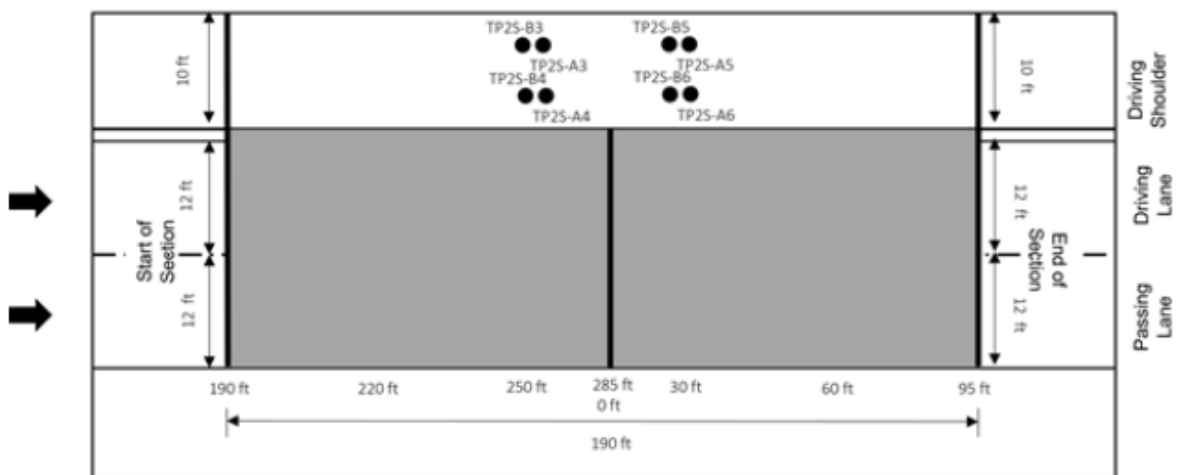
Cell 22 to 23 Transition Zone Sampling Plan (not to scale)
